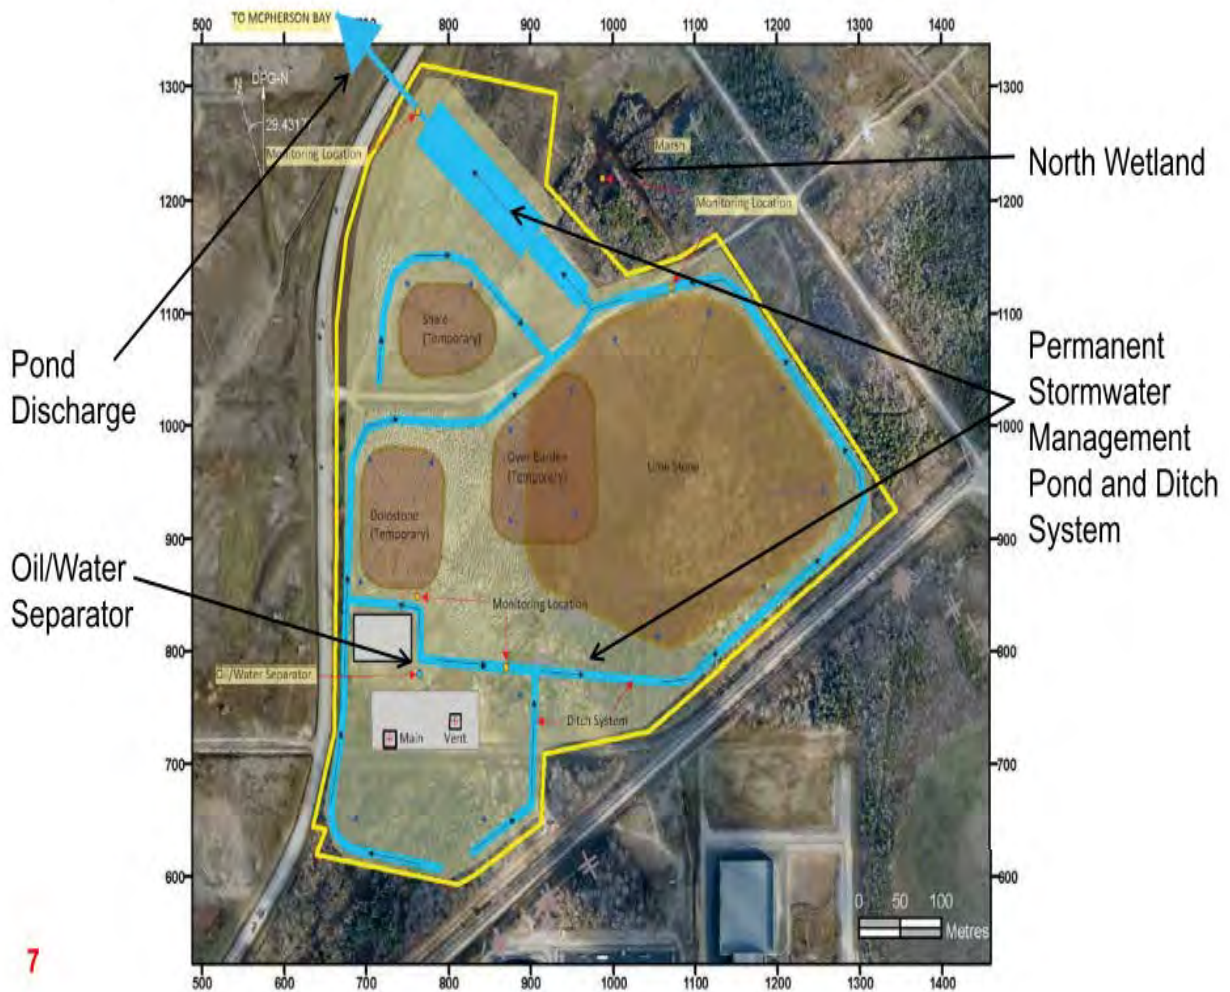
Proposed Water Management System including drainage ditches, stormwater management pond, drainage ditch at Interconnecting Road (pond discharge) and oil/water separator (reproduced from OPG PMD 13-P1.1M, Slide 7)
